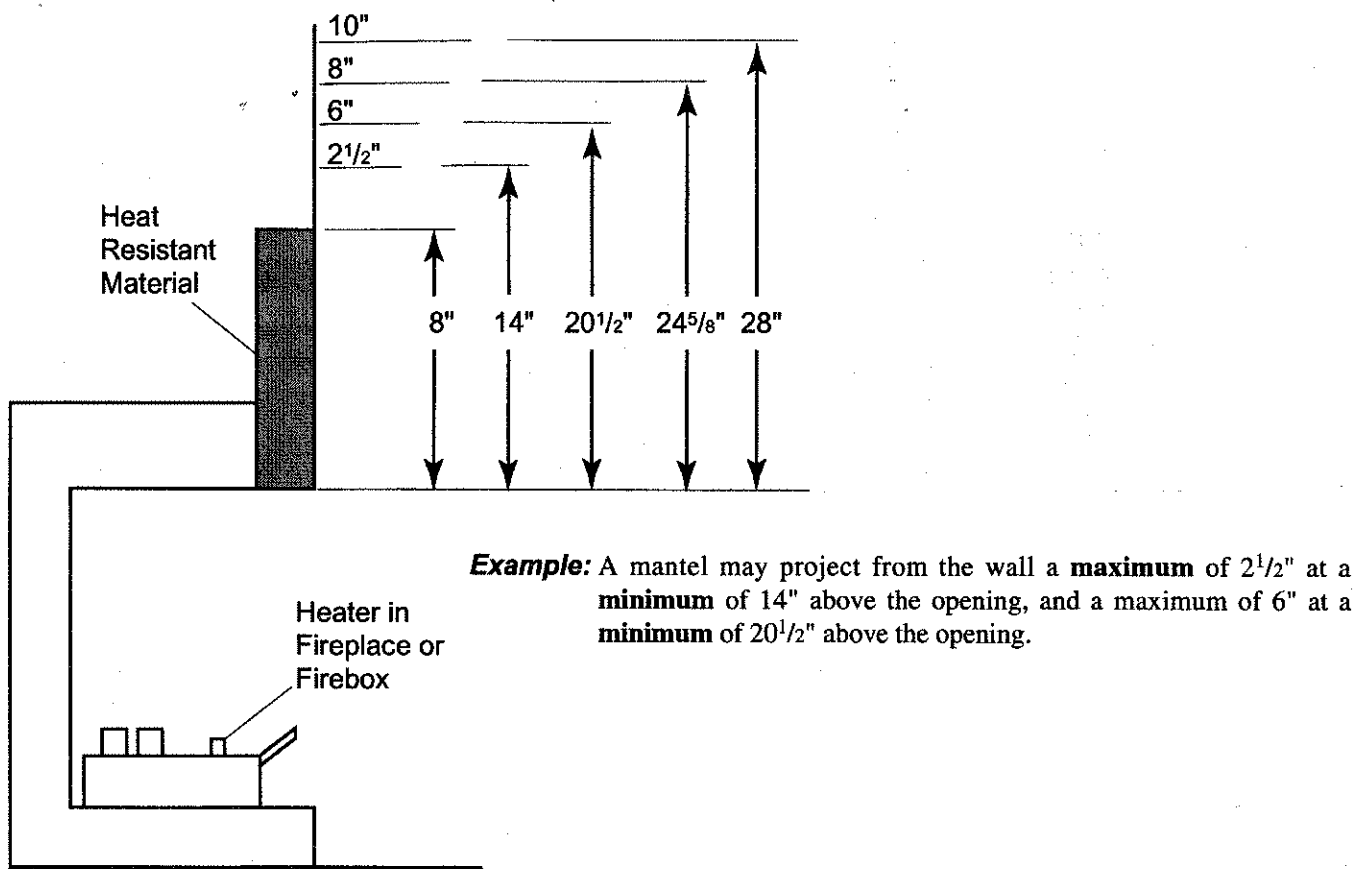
Minimum Mantel Clearance with No Hood - DEB20
